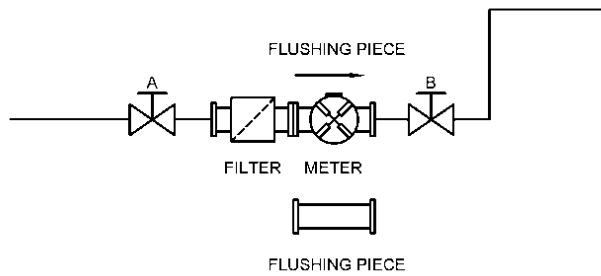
Flowmeter setup without bypass piping arrangement and flushing piece.
